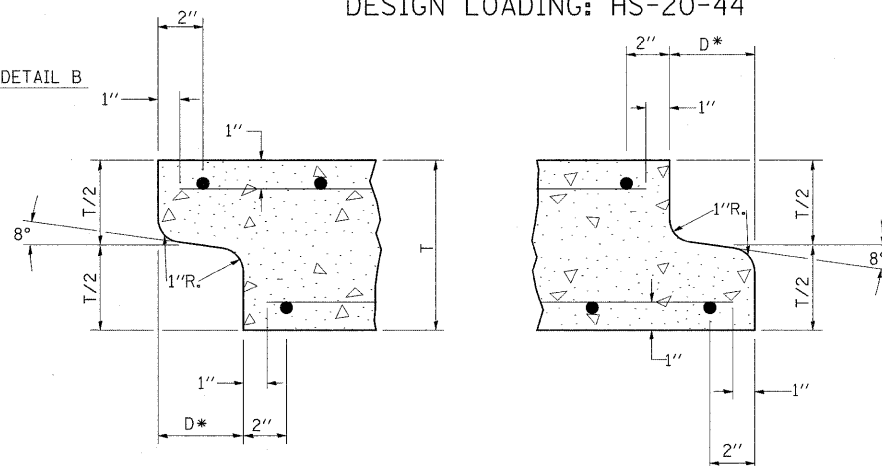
DETAIL OF PRECAST CONCRETE BOX CULVERT SECTION
